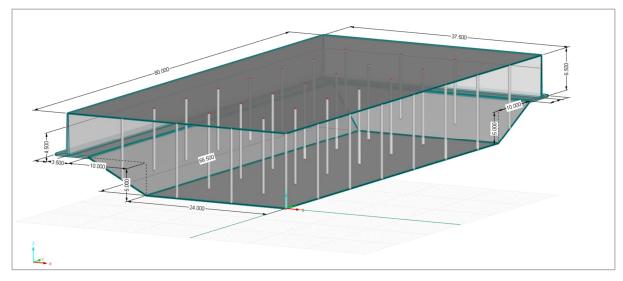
Type 3 - Example of Earth fill embankment type or hopper bottom reservoir (m)
